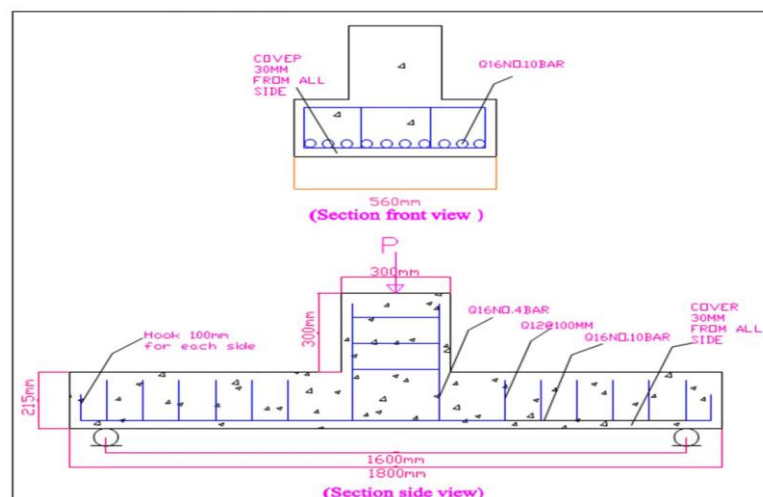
Typical Dimensions (mm) and Details of Tested Wide Beam
